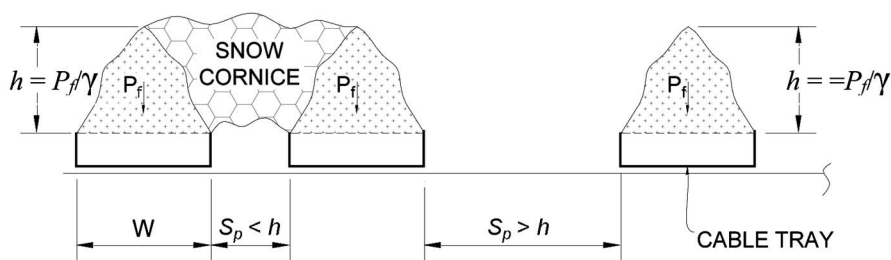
Snow load on multiple cable trays/pipes at same elevation.
